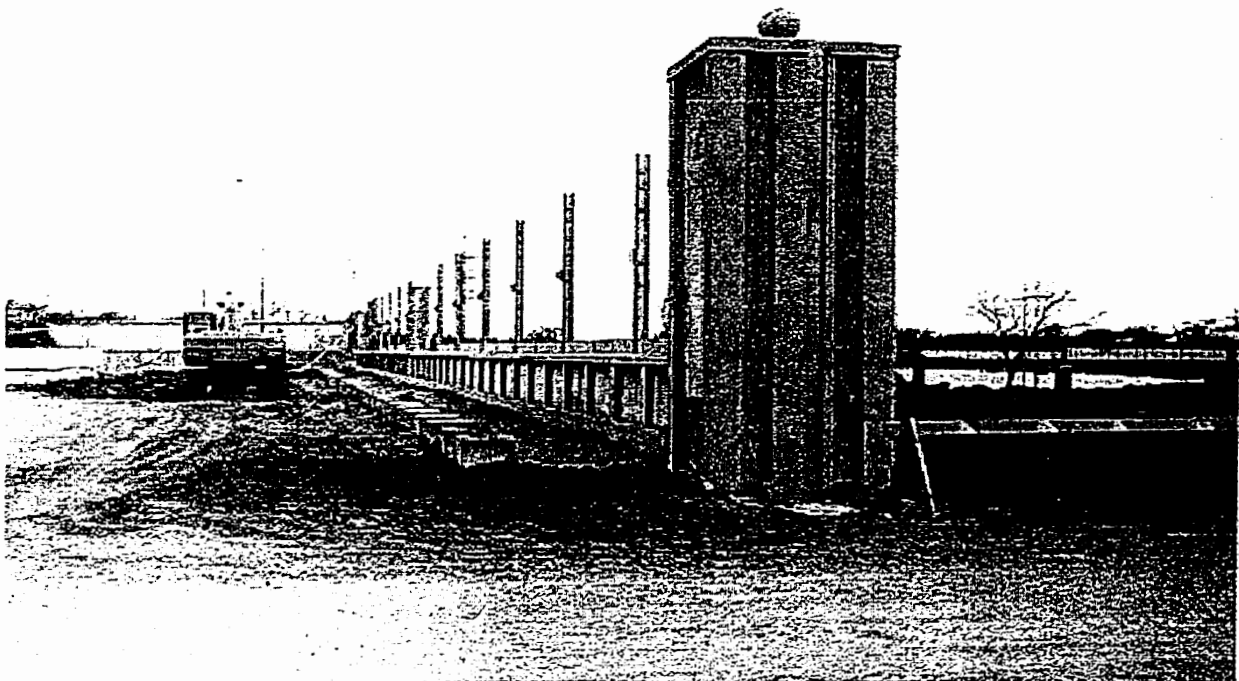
Floodwall construction in Grand Forks, North Dakota Source: Flood Control of America
